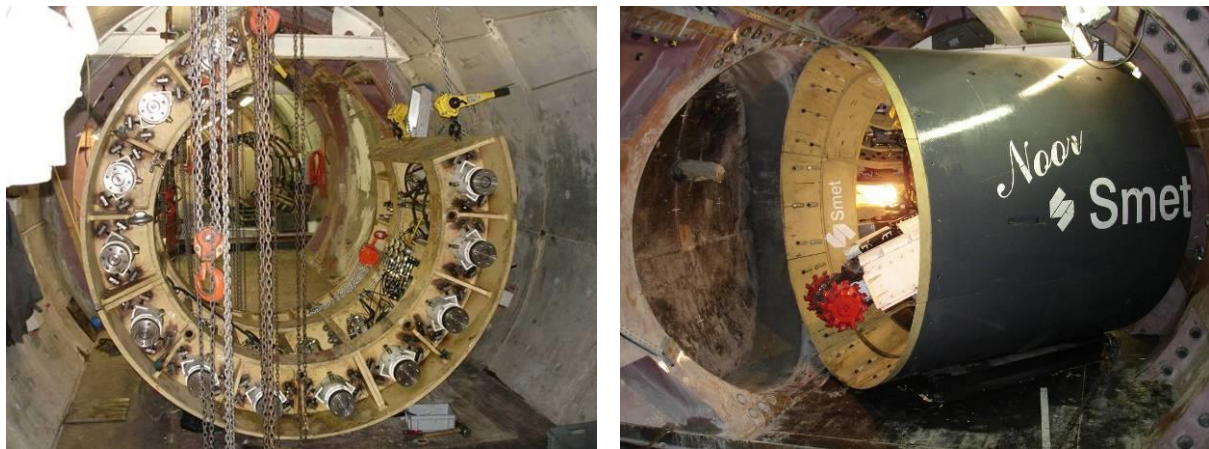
Underground assembly of the tunnelling machine and positioning in front of the entrance.
